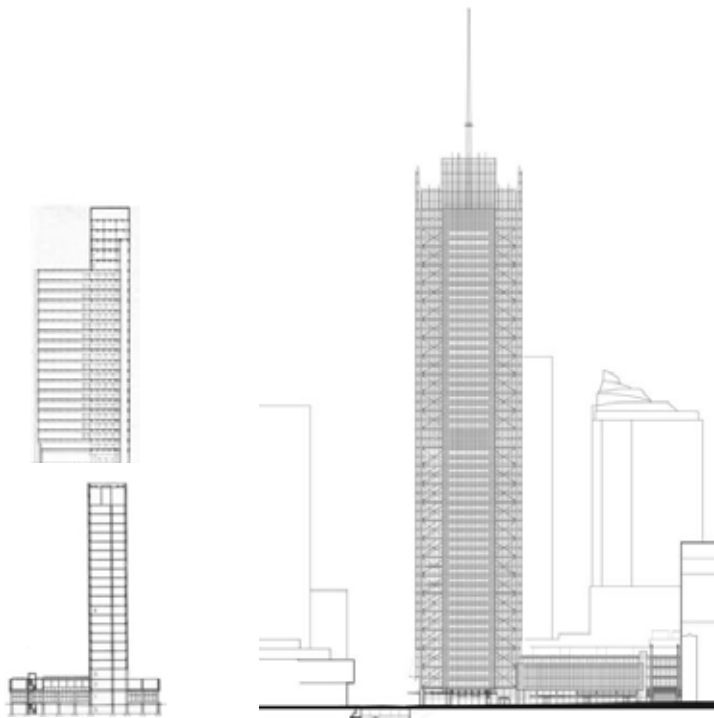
INLAND STEEL BUILDING (ABOVE)
